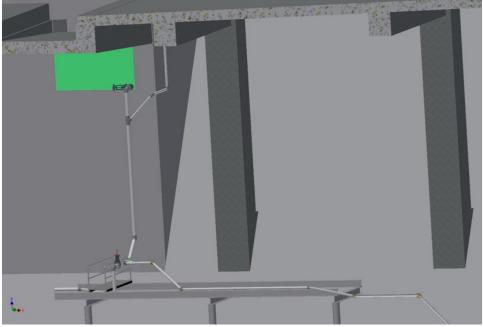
New Air Vent Attachment on Drainage Pipe
